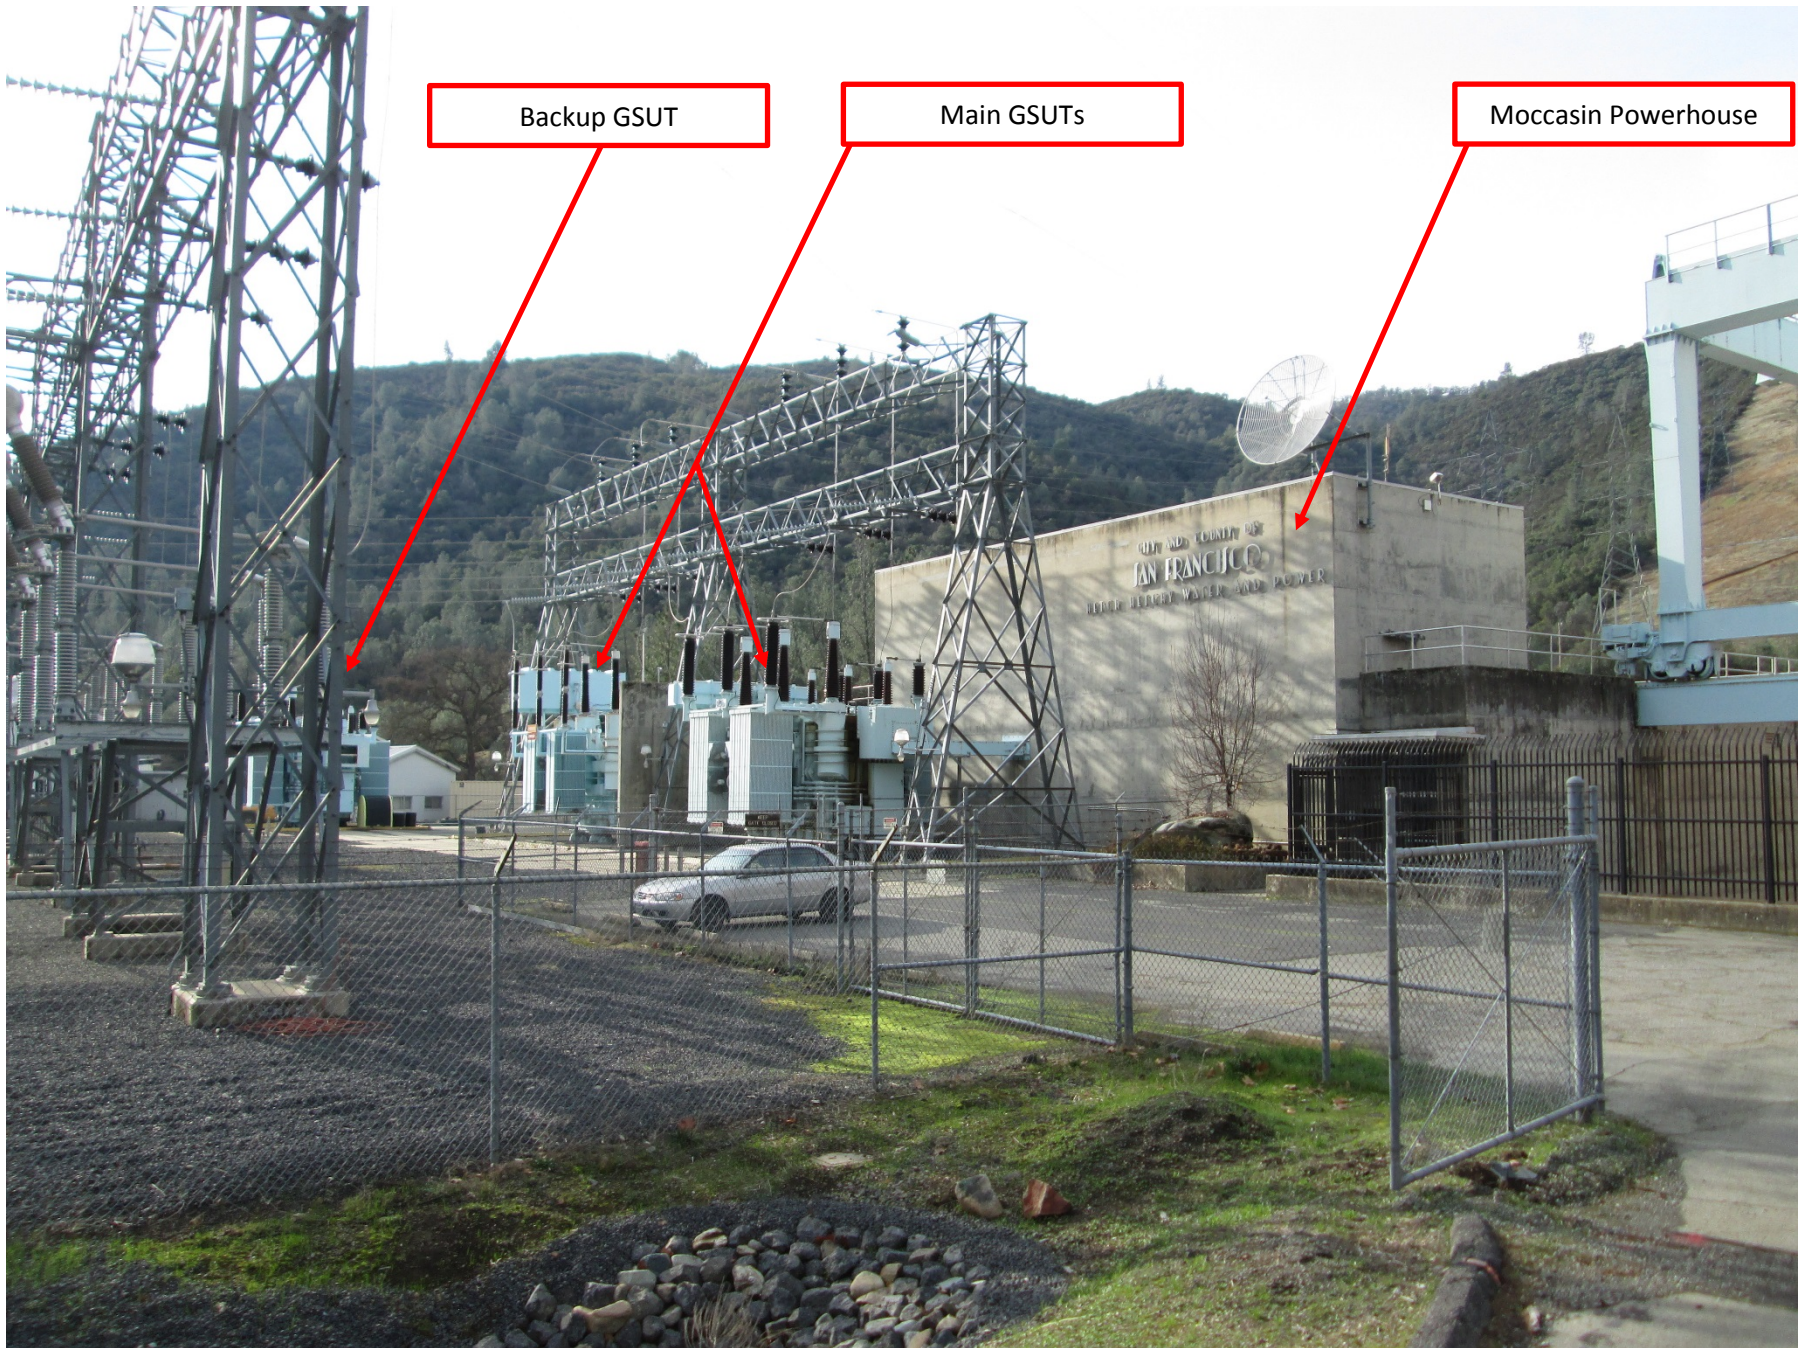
Moccasin Powerhouse, existing GSUTs, and yard.
